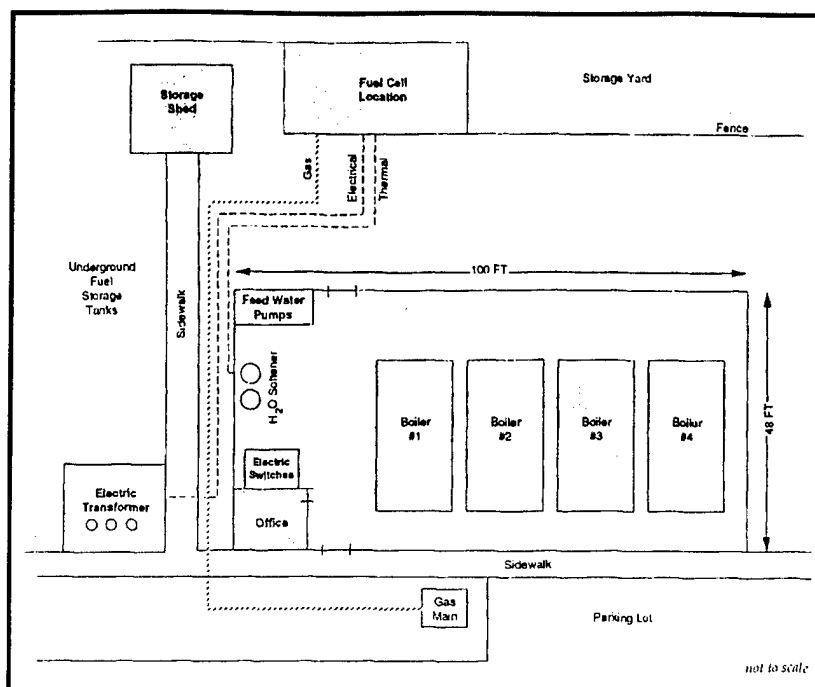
Kirtland AFB Central Heating Plant site layout and fuel cell location.
